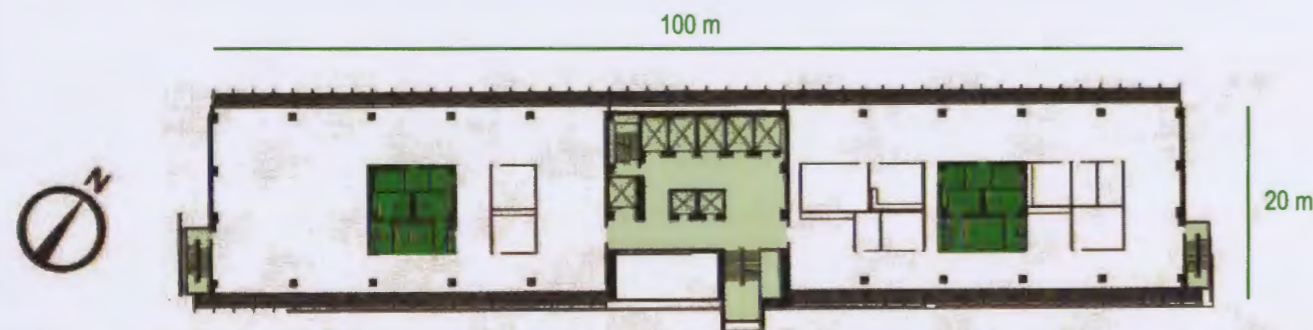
typical floor plan of tower block of San Francisco Federal building by Morphosis
